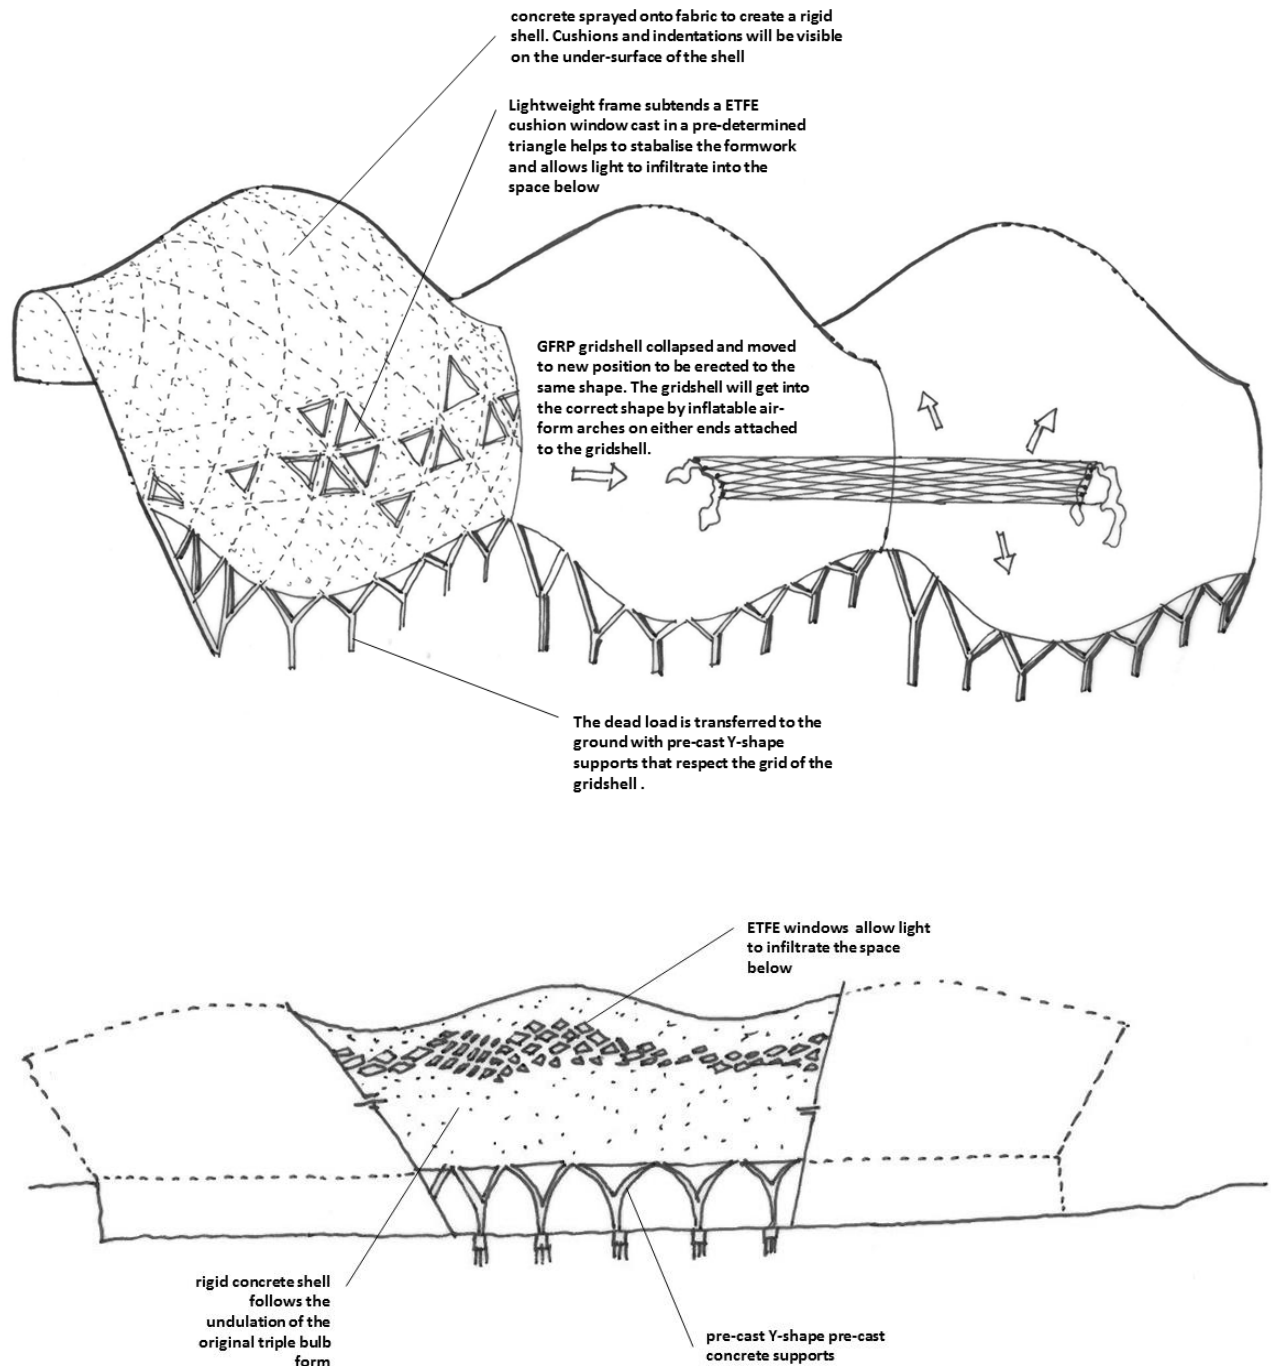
top: Repetitive Concrete Casting in sequential construction
